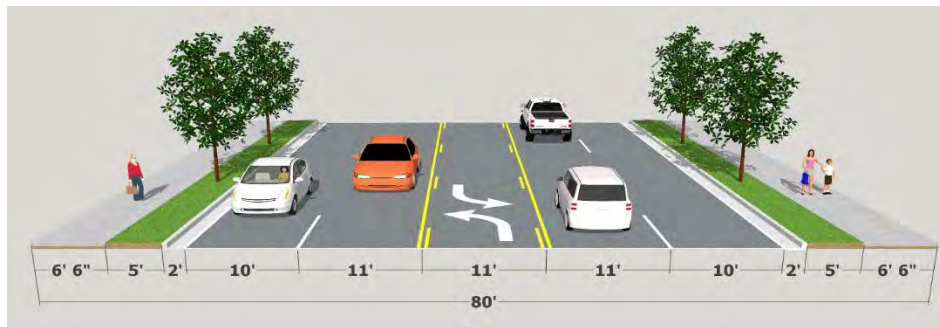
5-Lane Alternative (B) - Street Trees & Sidewalk
